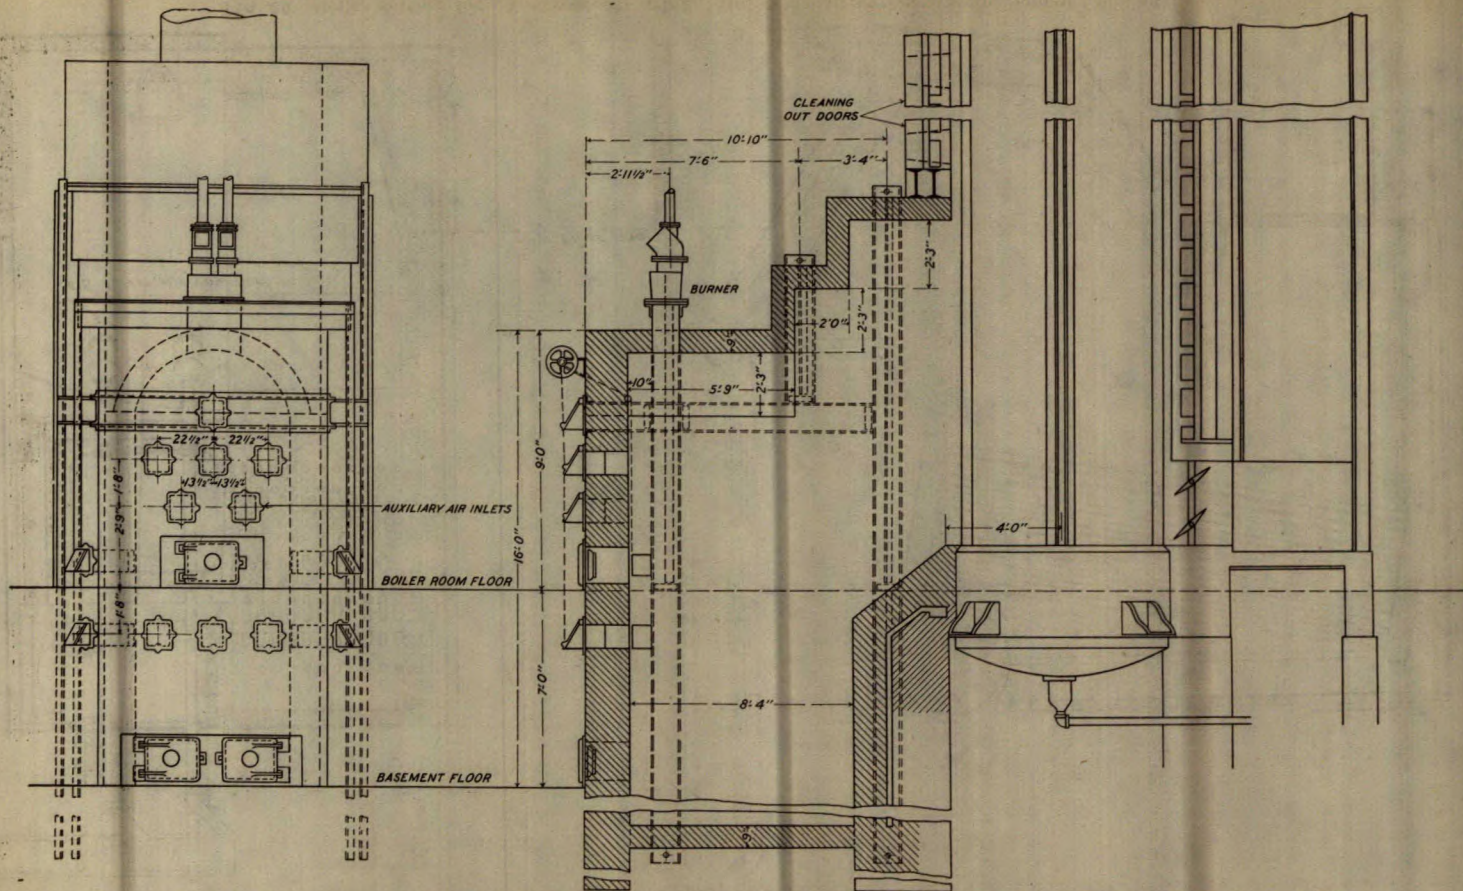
Arrangement of combustion chamber for firing a Wicket boiler with powdered coal. Pulverized Fuel Equipment Company.
